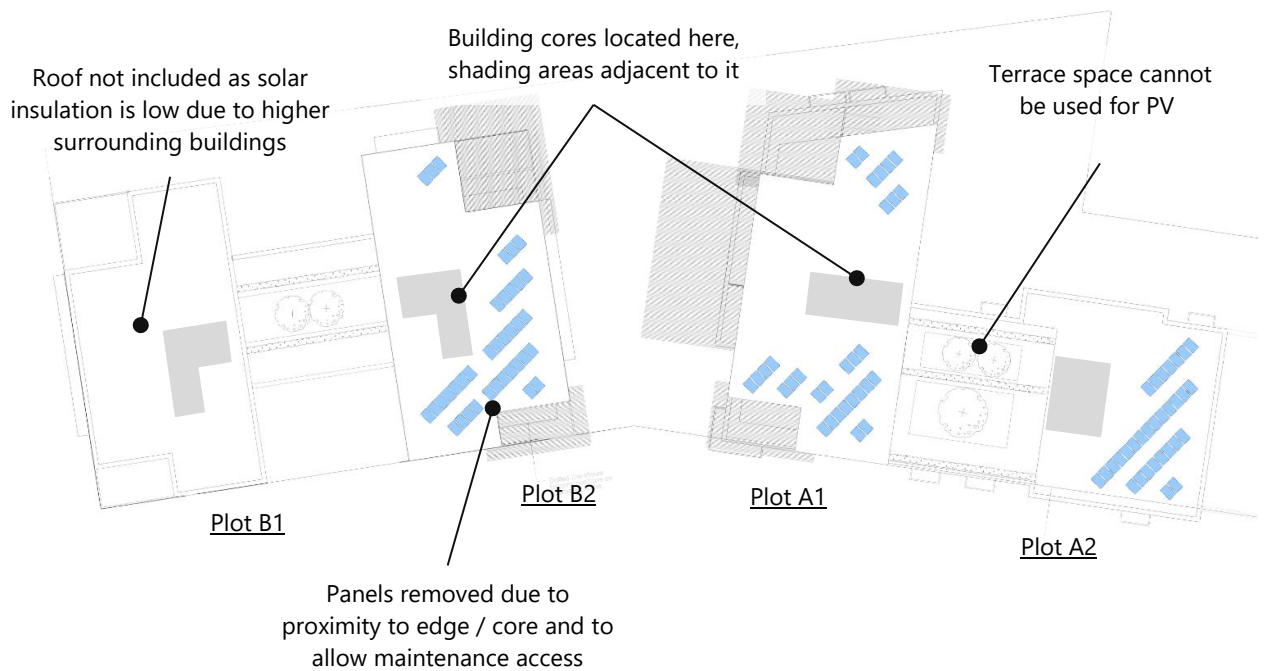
17 the detailed PV layout for the roofs of plots A and B as based on the optimisation
